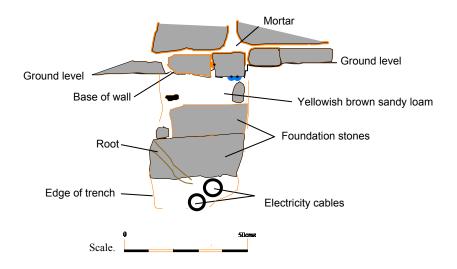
Southwest facing section of wall of privy chamber of Bedehouse.
